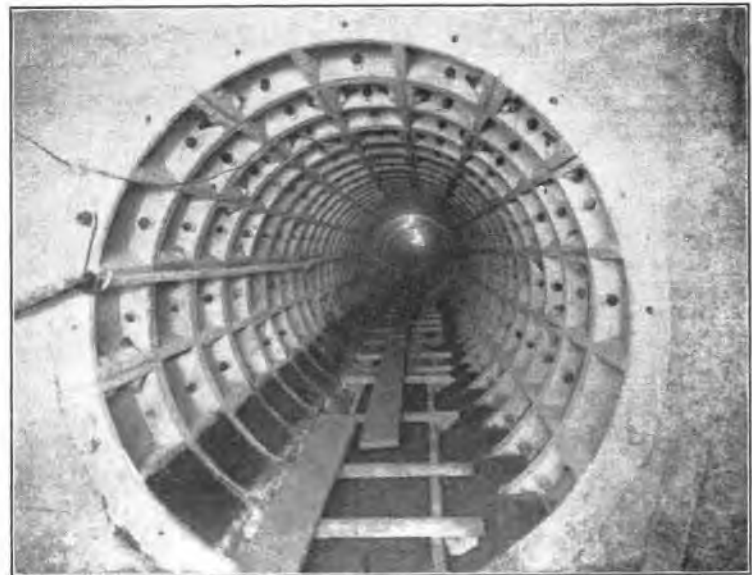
REINFORCED CONCRETE CABLE TUNNEL.
